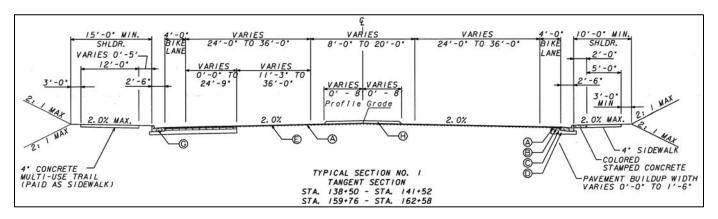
A.6: Atlanta Road over Chattahoochee River Typical Section
